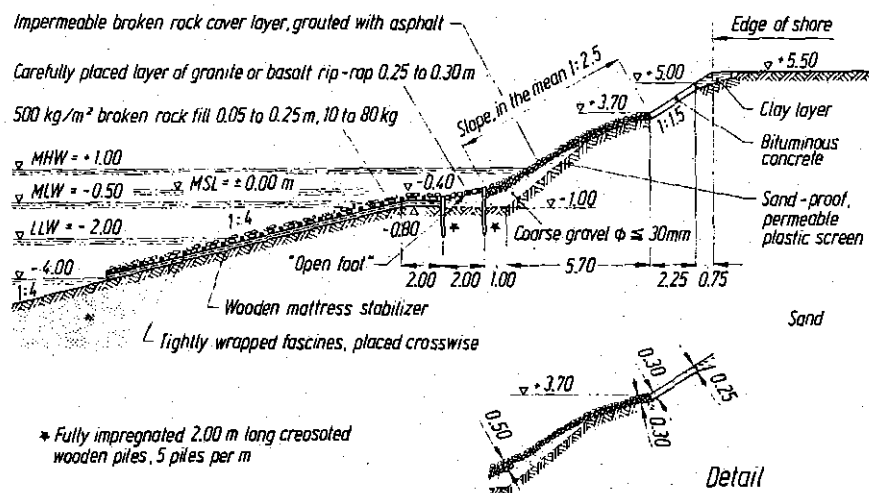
Standard construction of a harbor embankment in Rotterdam, with impermeable revetment
